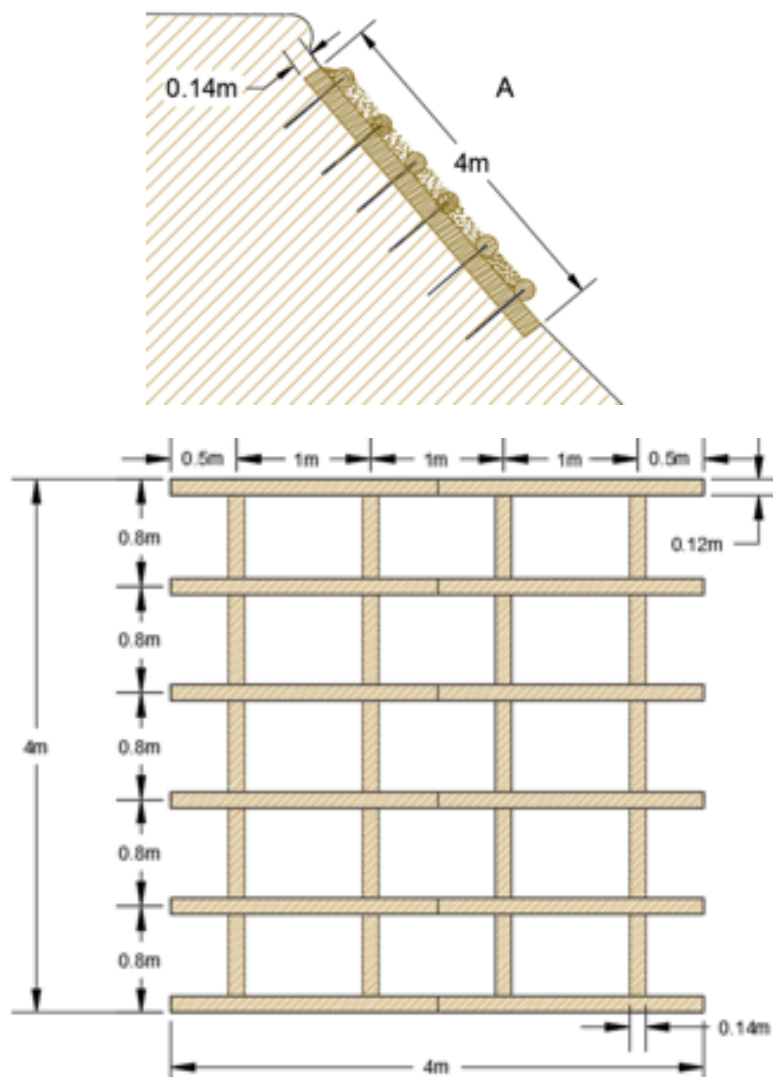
Profile and plan view for the slope lattice A planned in Action 3.
